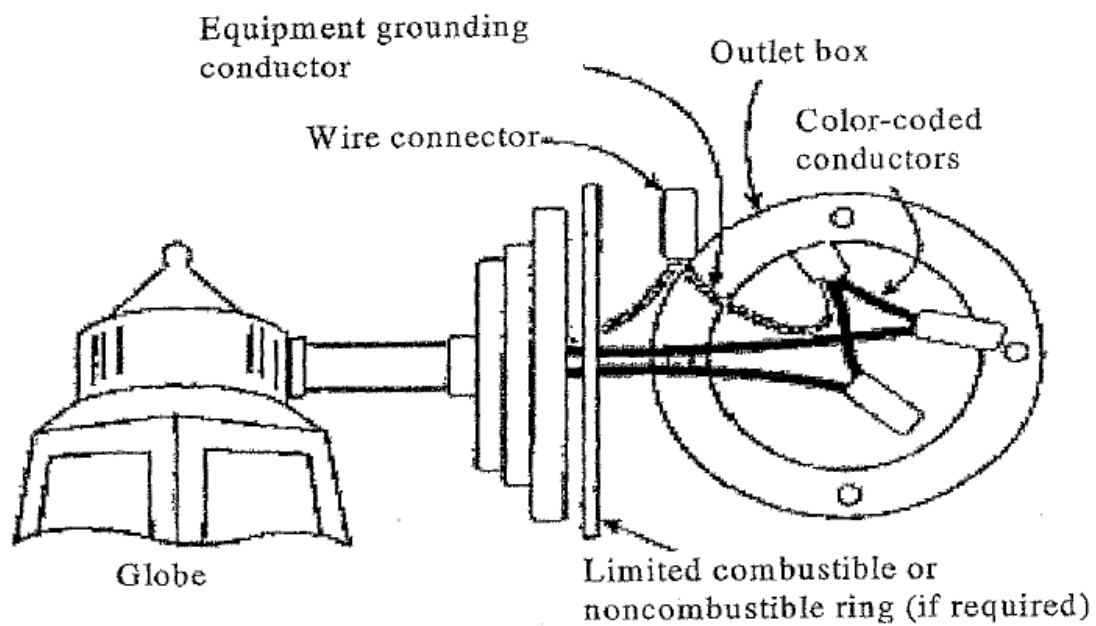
Typical Installation of Surface-Mounted Exterior Lighting Fixture.
